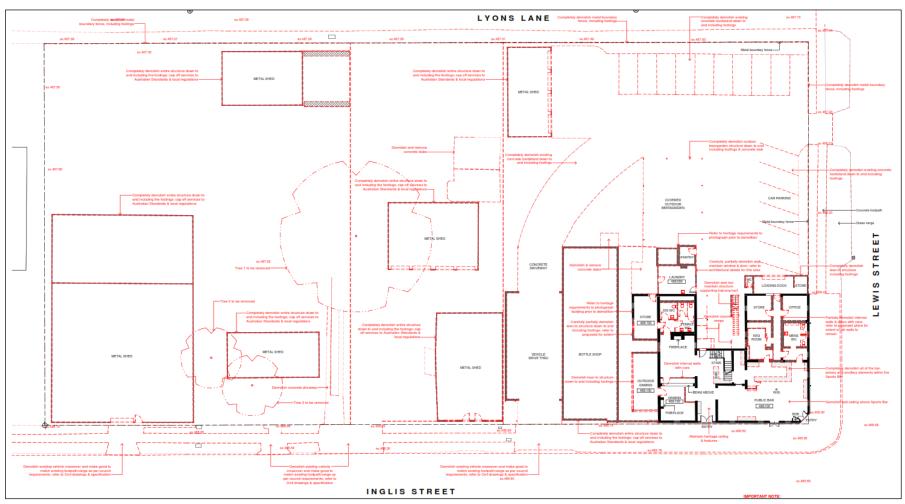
Demolition Plan for consolidated site. (Source: Bergstrom Architects refer to drawing number DA090)
